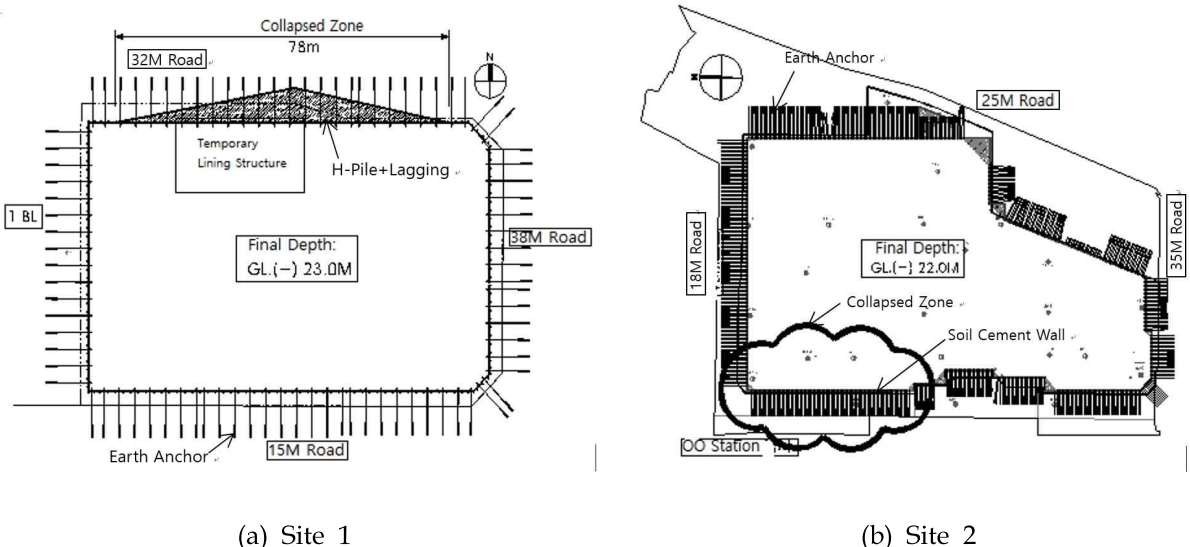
Plan view of in-situ wall systems at each site and collapse zones (Kim, 2012)
